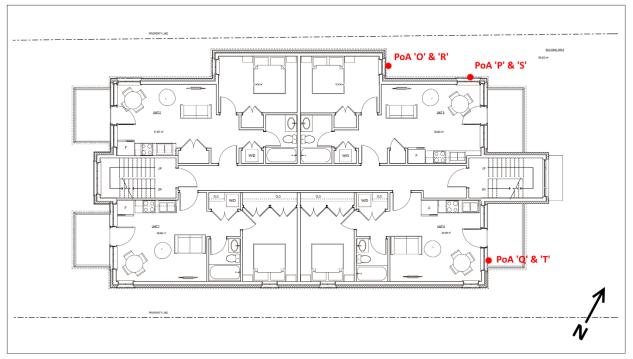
Site plan showing location of Points of Reception POA 'O' through 'T' on Floors "Ground" and 3 of Building 'B'.
